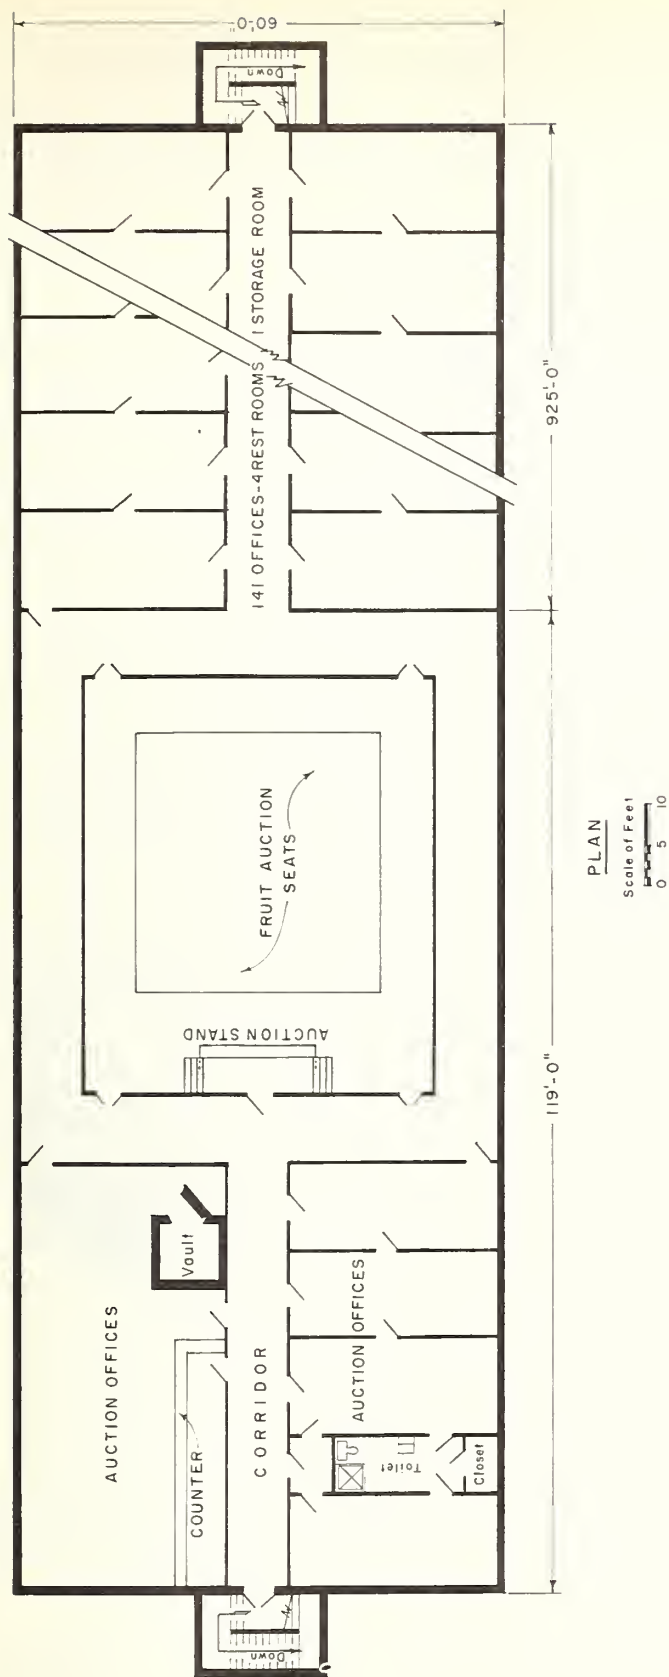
Plan of Auction and offices on the second floor of a fruit and vegetable building.
